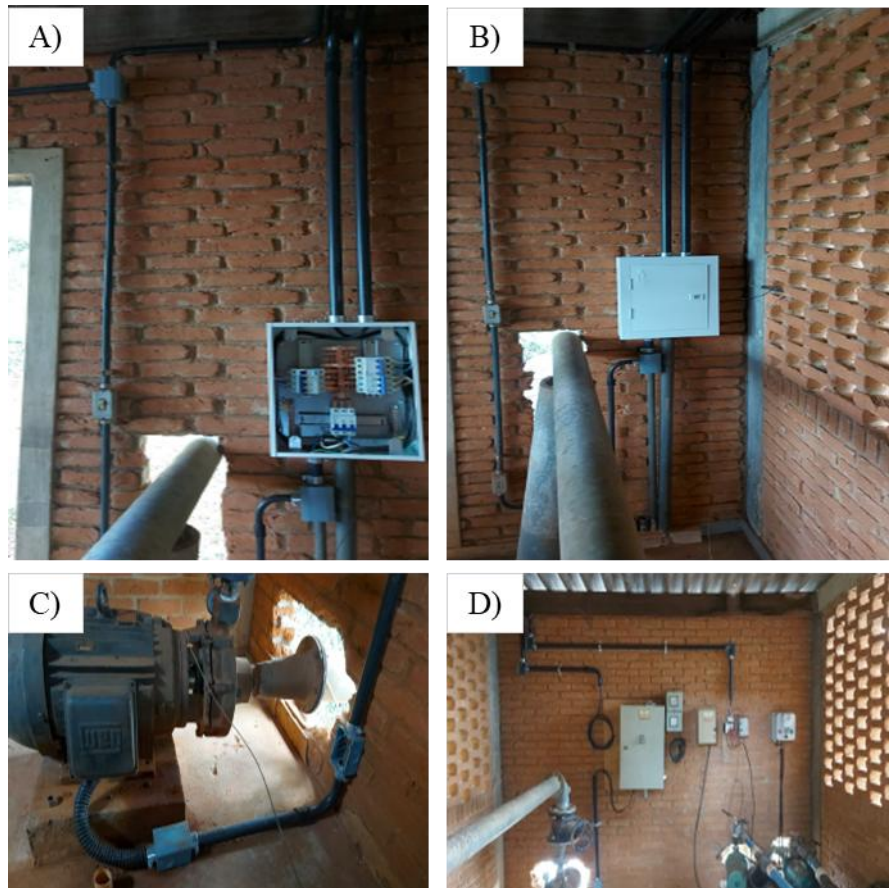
Assembled distribution panel and PVC conduit (A). Installation detail (B). External electrical installation of the motor (C). General view of the back wall of the pump house (D).
